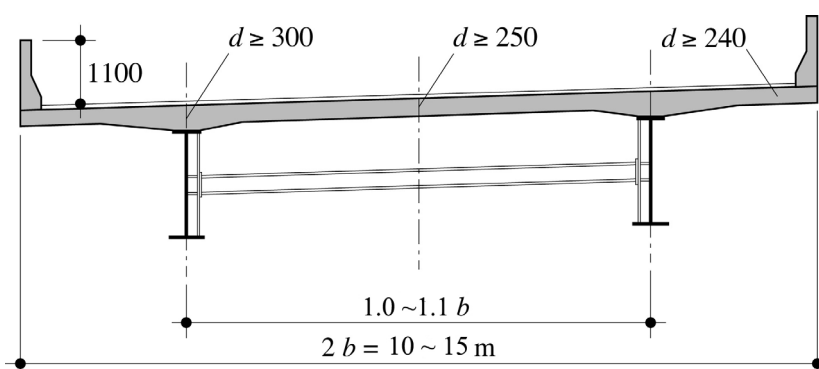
Twin I-girder section of composite bridges [Lebet and Hirt 2009]
